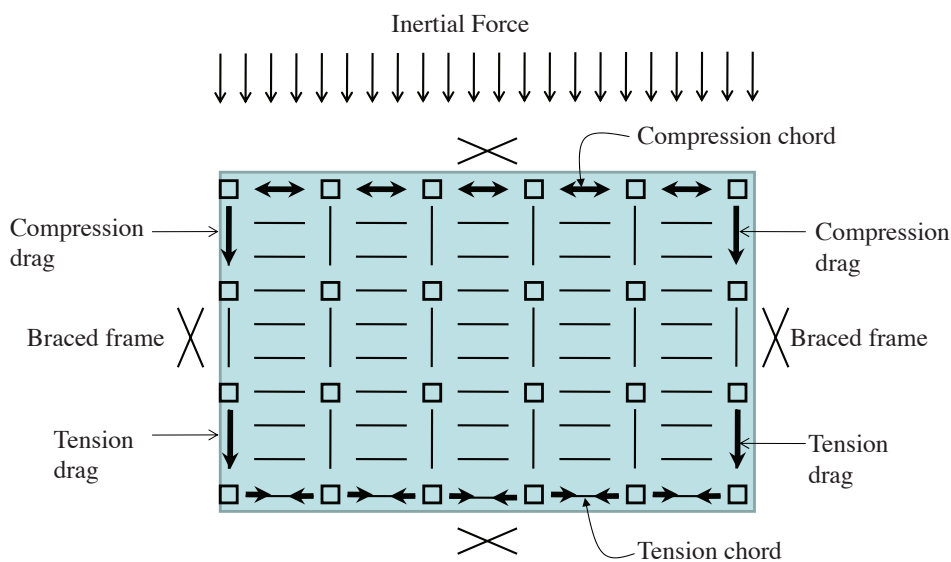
Typical steel framing plan illustrating diaphragm drag struts and chords.
